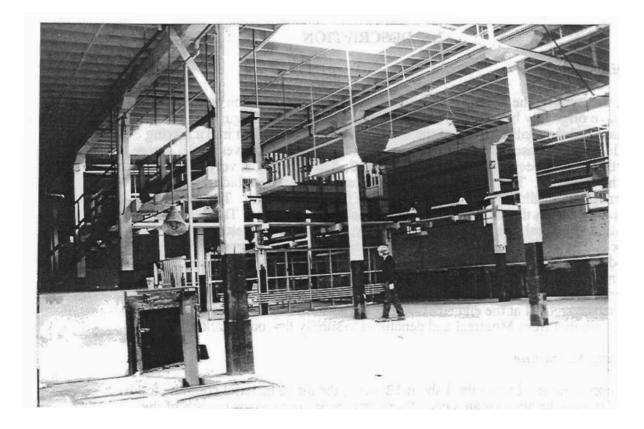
Main floor of Denaturing Building (Building #47) looking towards the mixing mezzanine. Source: Historica Research Limited, December, 1993
